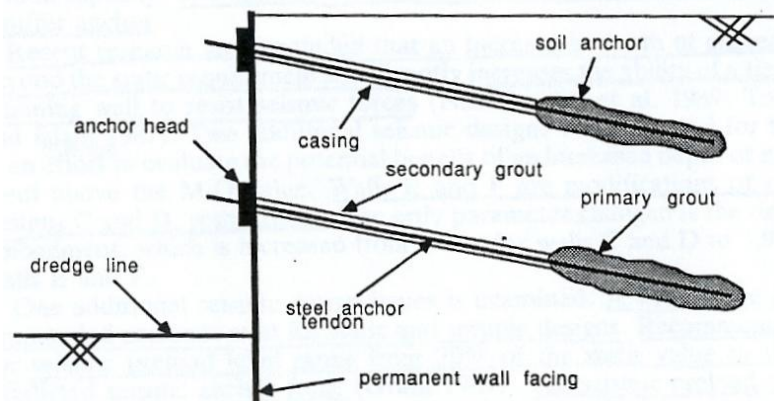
Components of a tiedback retaining wall. Adapted: Siller and Dolly, 1992.
